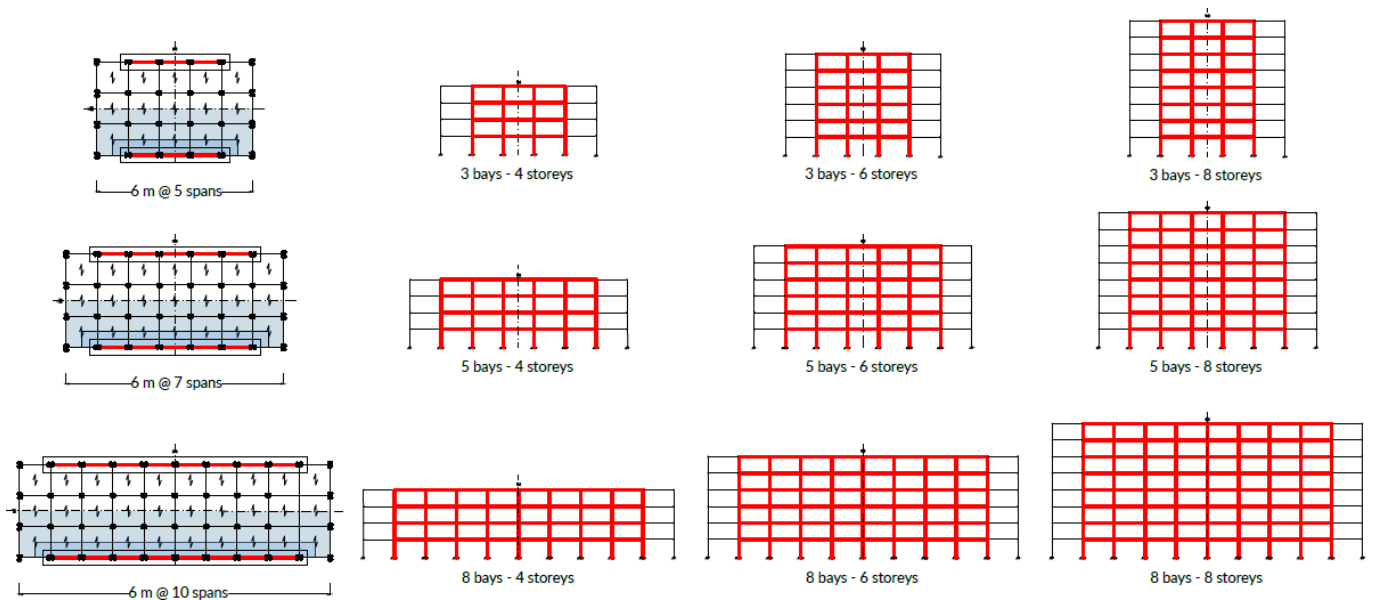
Case-study buildings: (a) Plan views; (b) Elevation views.
